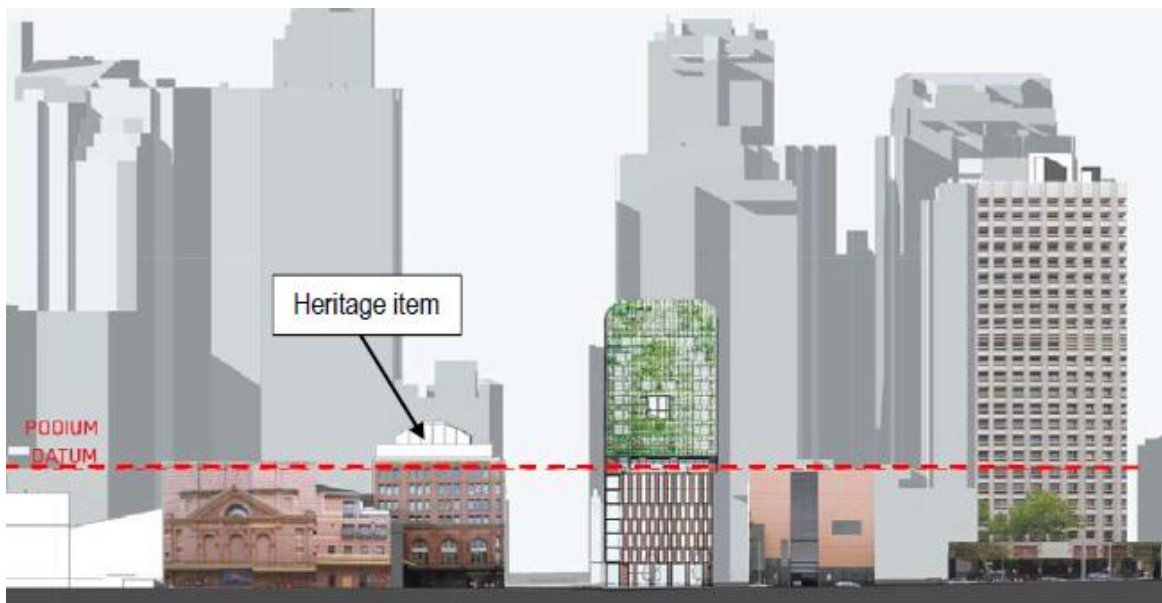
Podium datum (north elevation) in relation to surrounding development along Hay Street
